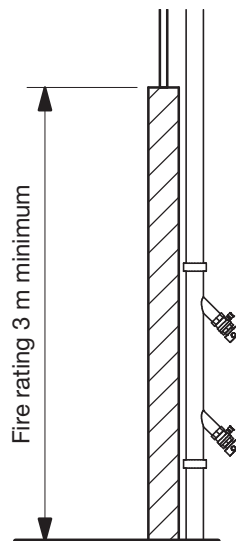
Unsprinklered building – Hydrant outlet protection – Fire rating required – Section view
